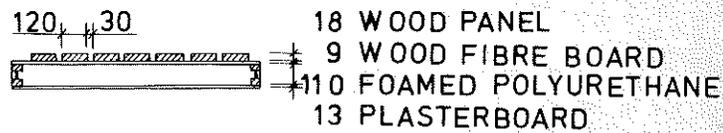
Section through panel wall made up of sandwich panels left over from the construction in 1965 of the HSB test building at Landsbro, for testing in the laboratory 11 years later for determination of the U-value in the Guarded Hot Box. Dimensions in mm.
